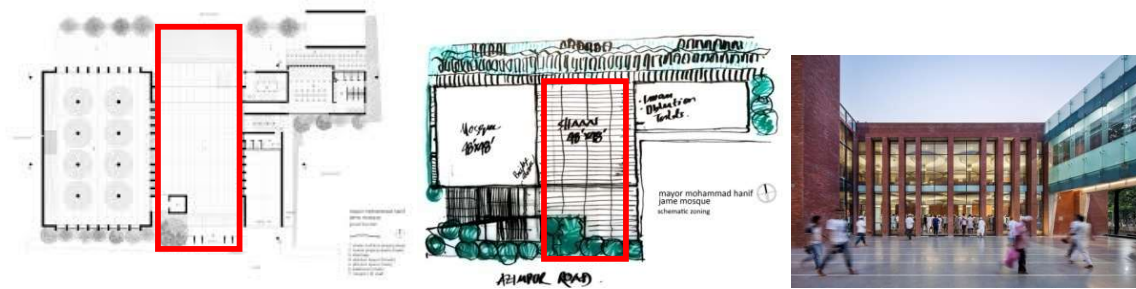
& 16 and Images 08 & 09: Ground Floor Plan, First Floor Plan of Mayor Mohammad Hanif Jame Mosque
